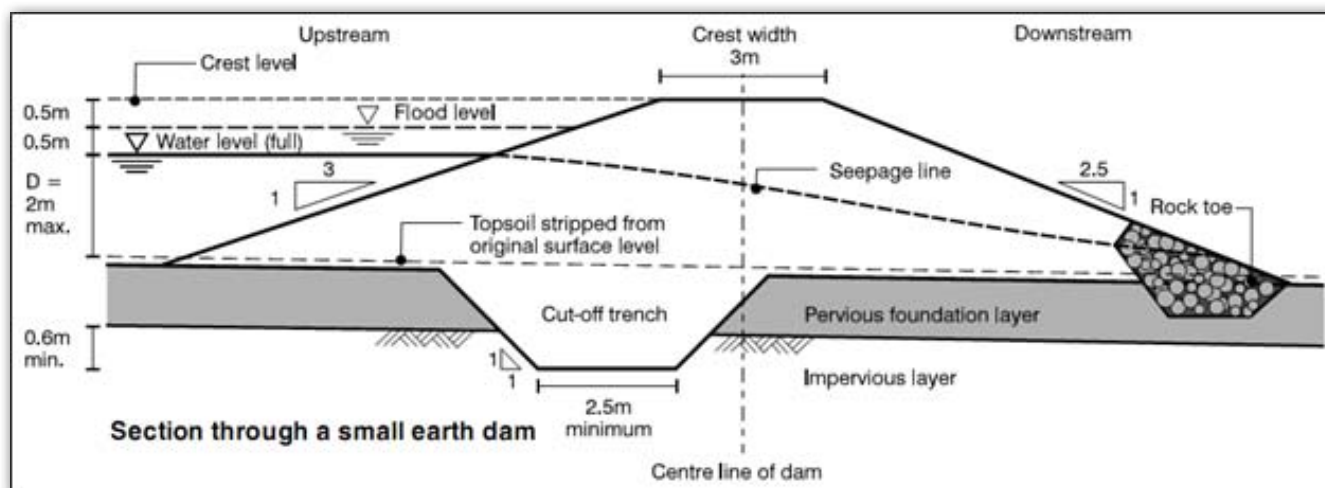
Typical cross sectional views and sections of an earth fill dam
